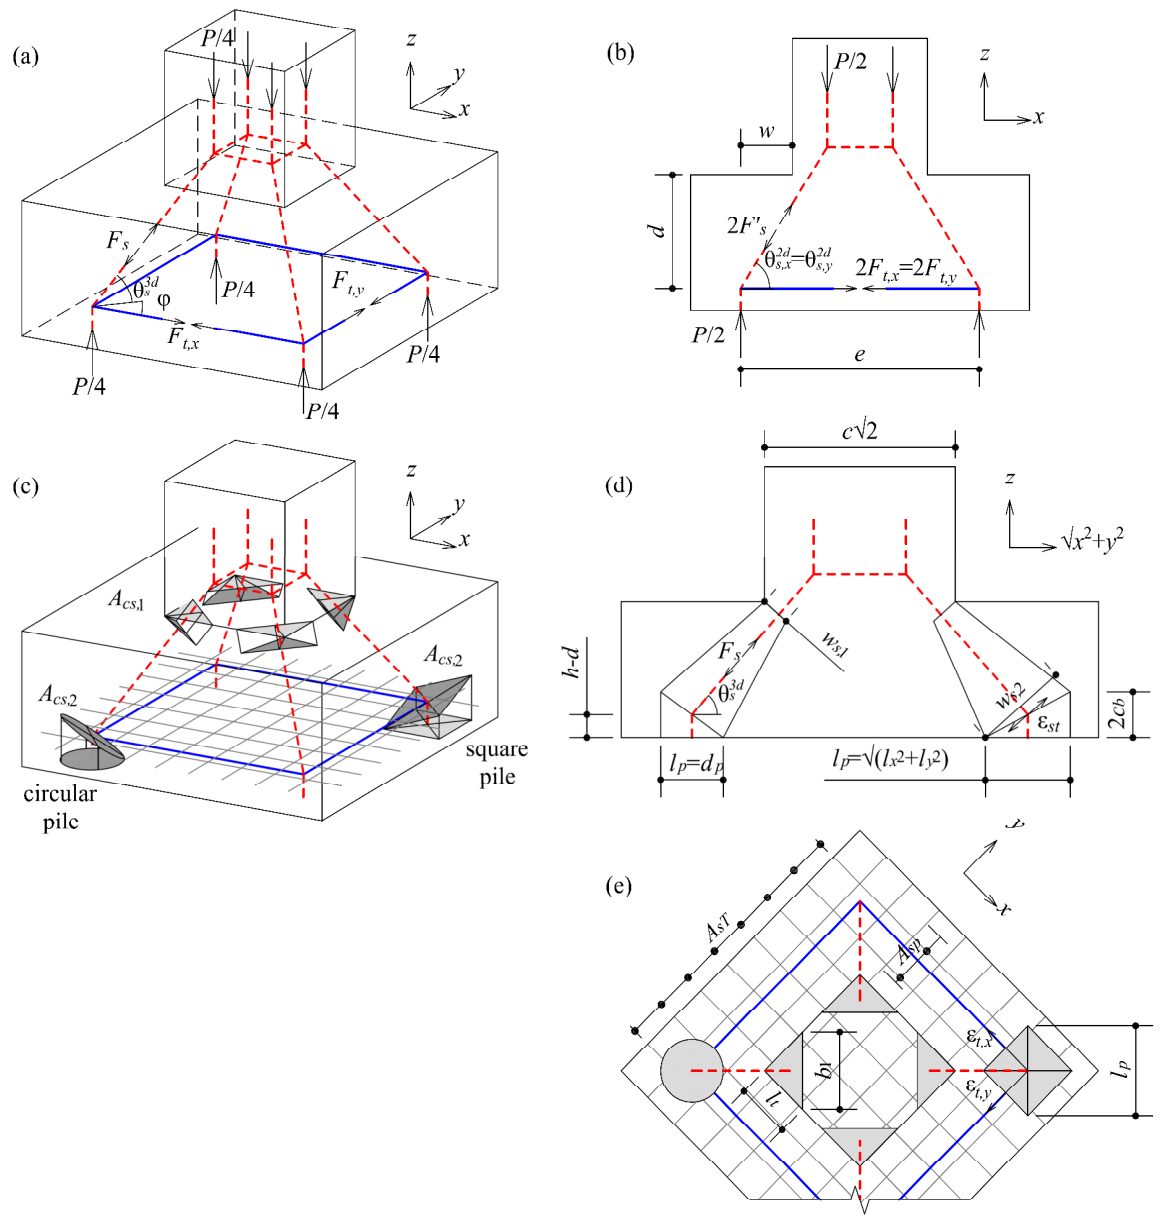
Proposed strut-and-tie model: (a) 3D truss; (b) 2D truss; (c) 3D view of strut and tie details, (d) strut projection onto cap diagonal plane and (e) plan view of strut and tie details.
